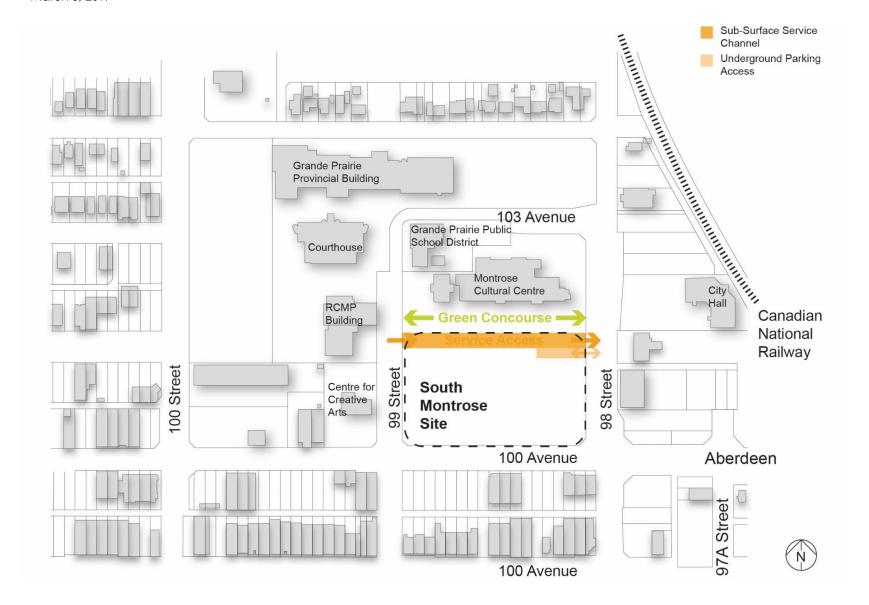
Site Service and Parking Access. Adapted from the South Montrose Master Plan (2016)
